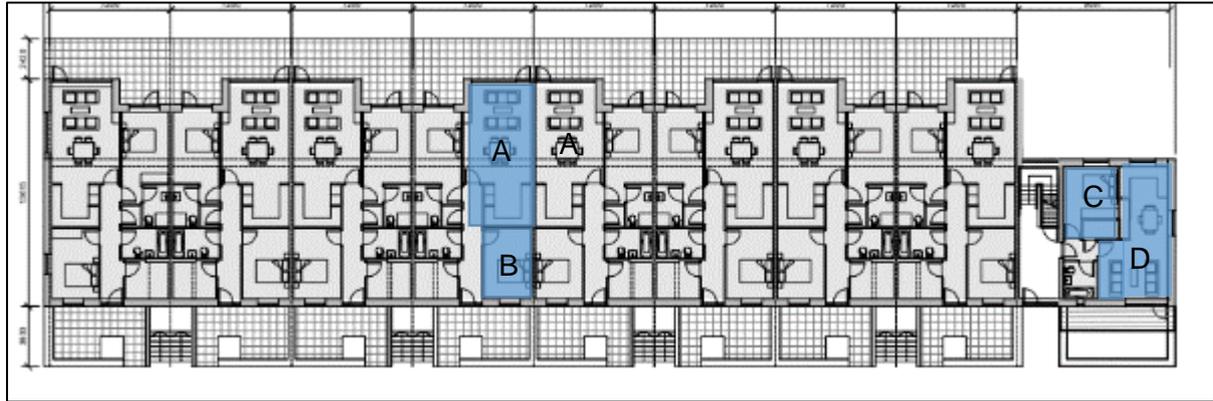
Block C2 – Ground Floor Assessed Rooms Highlighted in Blue
